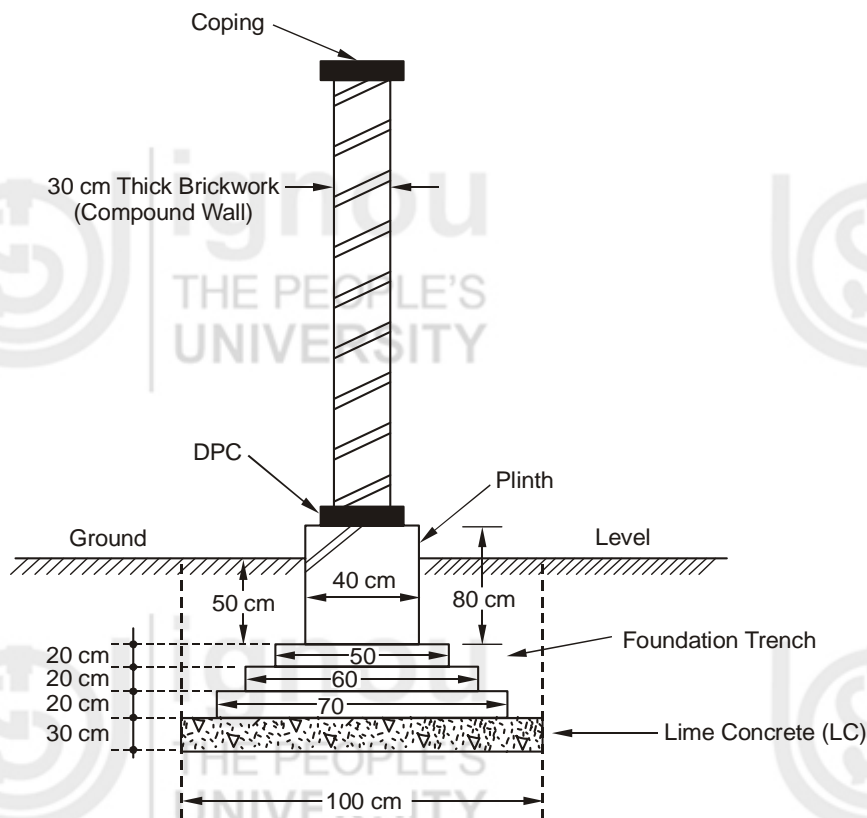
Section of a Straight Compound Wall in a Brickwork
